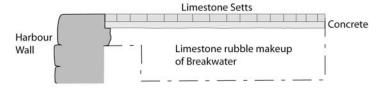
Sketch plan and section of Mooring Point 4 (approximate scale 1:100)
